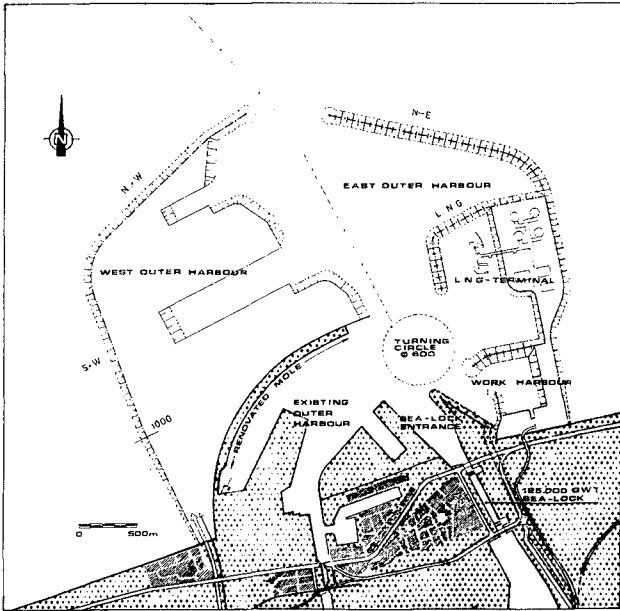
Layout Masterplan Zeebrugge Outer Harbour
